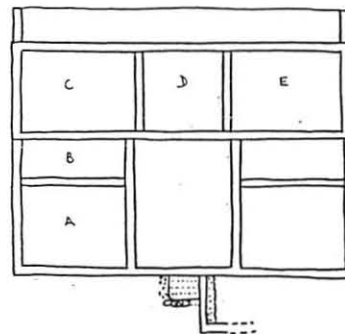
The rooms facing the street facades were all painted in a powder blue (c.1800).
